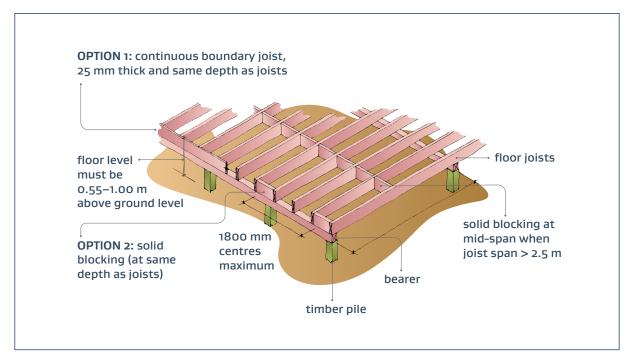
Foundation framing showing the floor joists and the blocking used to prevent these rolling over
